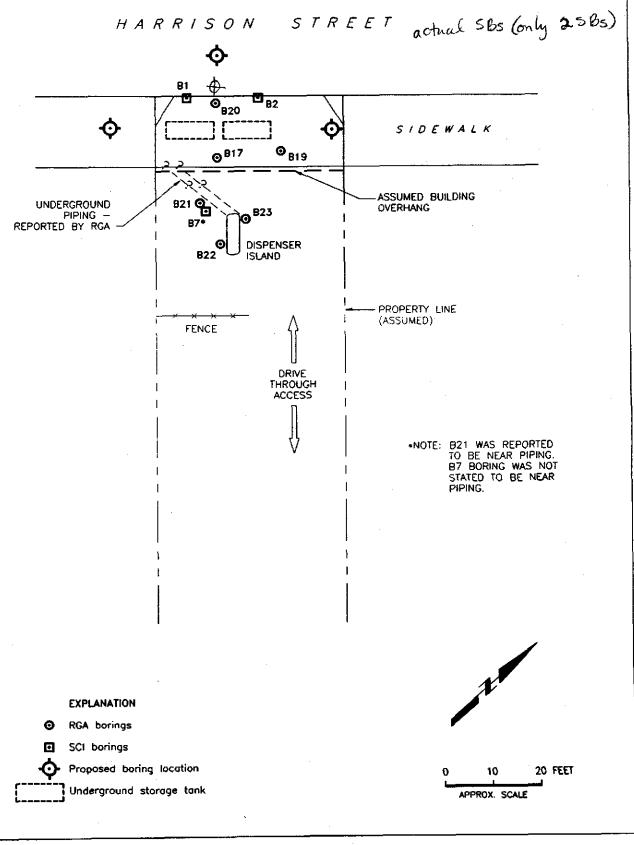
SITE PLAN SHOWING UNDERGROUND STORAGE TANKS IN HARRISON STREET SIDEWALK AND PROPOSED BORING LOCATIONS
